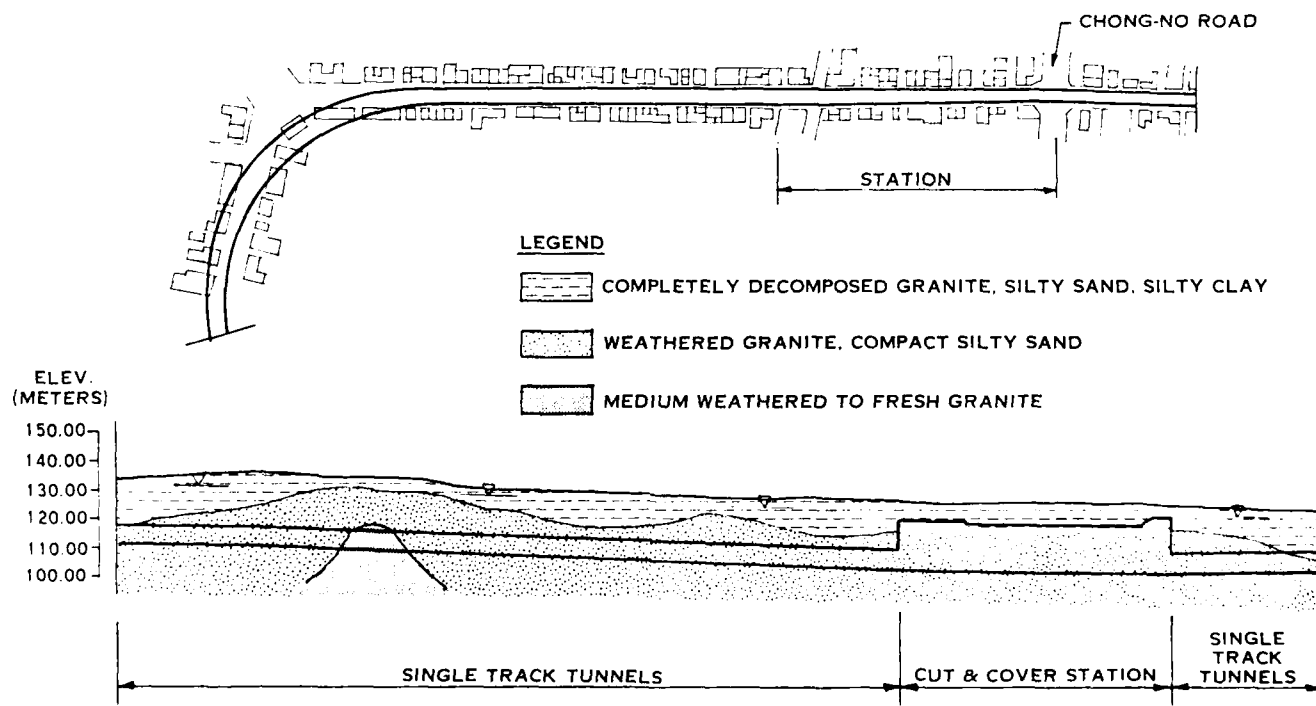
SECTION 321 PLAN AND SUBSURFACE PROFILE
